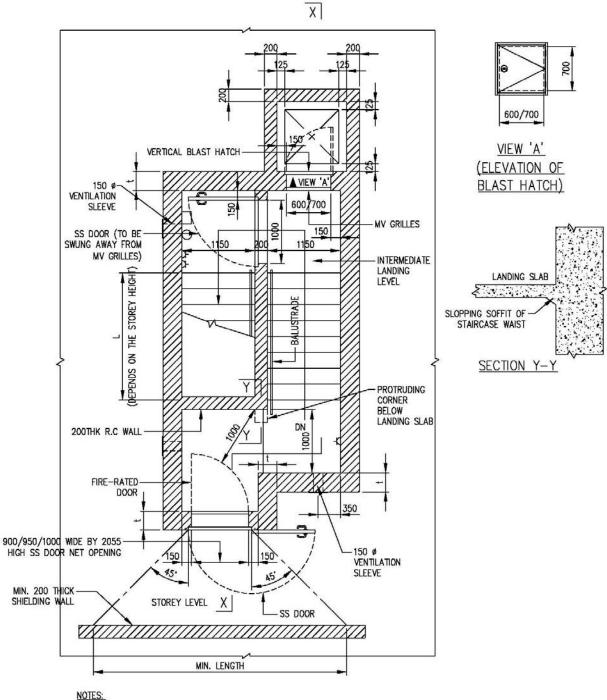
(a) TYPICAL PLAN OF S/C SS
